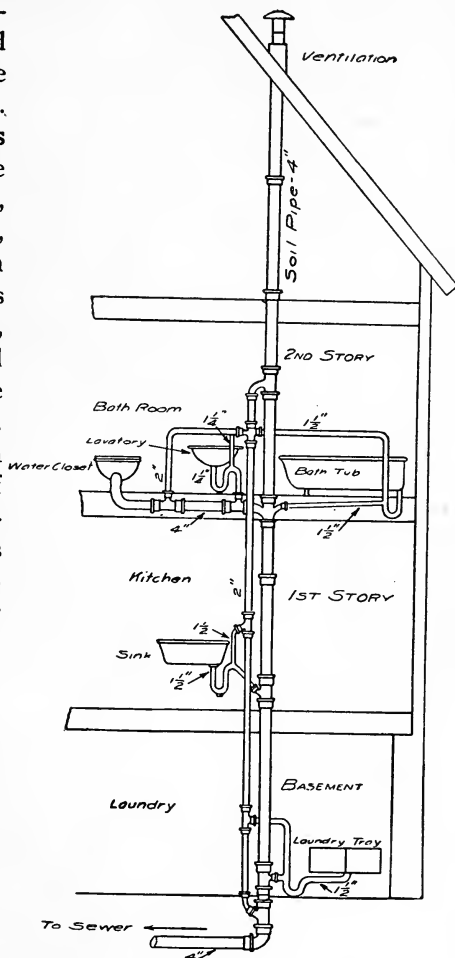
A plumbing system for a house, showing arrangement of fixtures, traps, and pipes. (Mo. Eng. Exp. Sta. Bul.)
